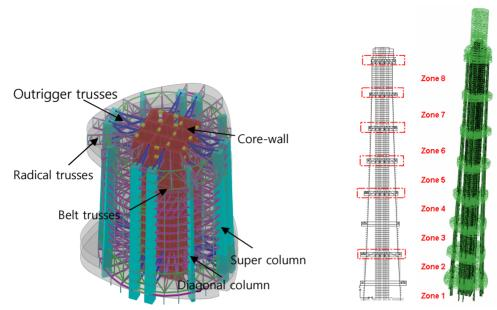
Structural system Fig.3. 3D FE model of Shanghai Tower Table.1 Parameters of super columns and core-wall in schematic design stage
